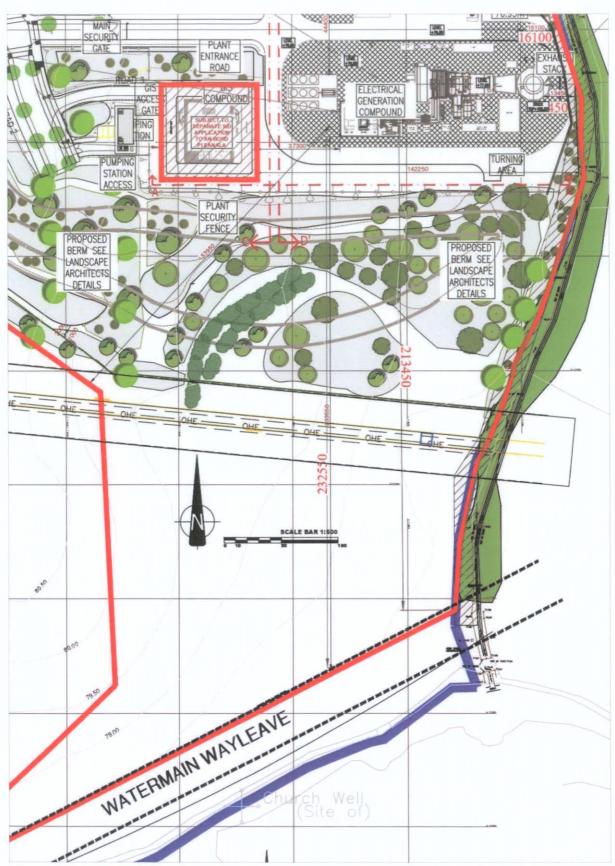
Proposed site plan part 3 (see drawing set for full resolution version)
